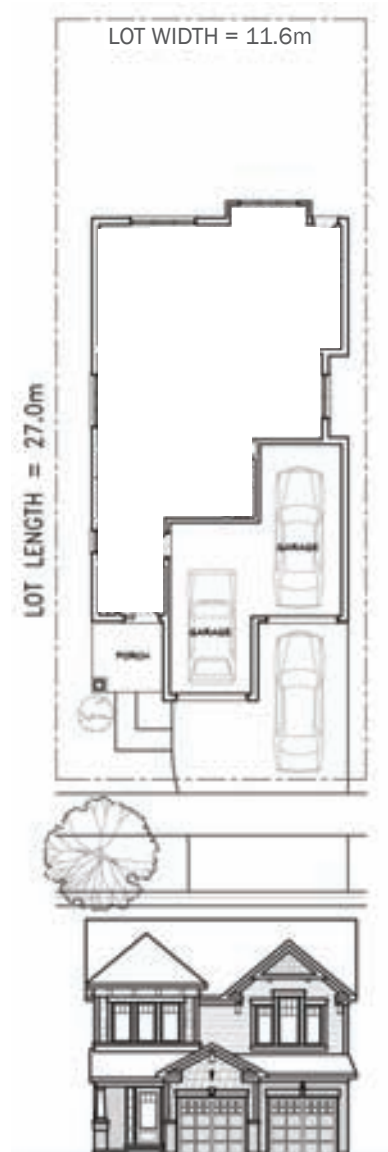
Plan View and Elevation of Staggered Garage
